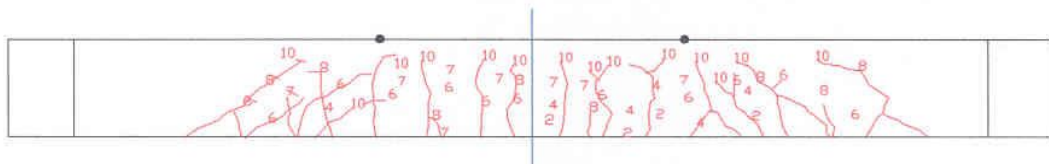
Delamination shear failure of 1-layer CFRP sheet
